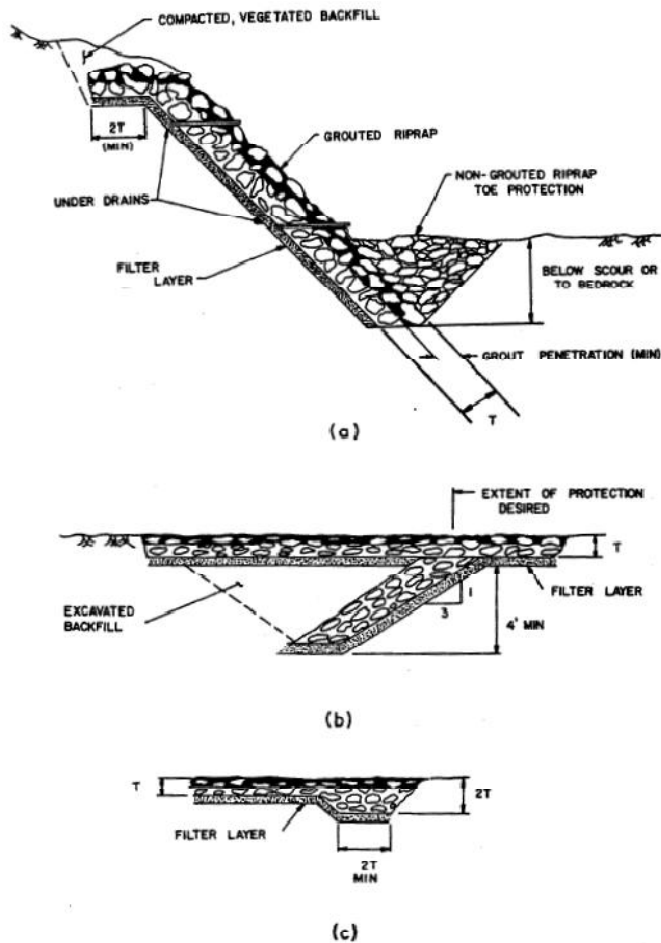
Grouted riprap sections: (a) section A-A; (b) section B-B; and (c) section C-C. (refer to figure 39 for section locations)
